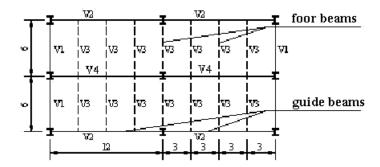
Schematic view of floor structural arrangement – configuration 03 (measures in m).
